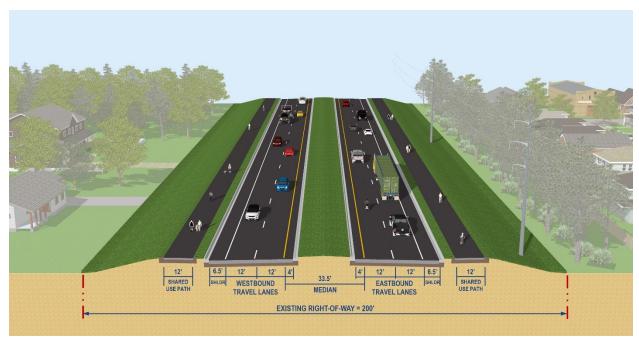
Turnbull Creek Bridge Proposed Typical Section
